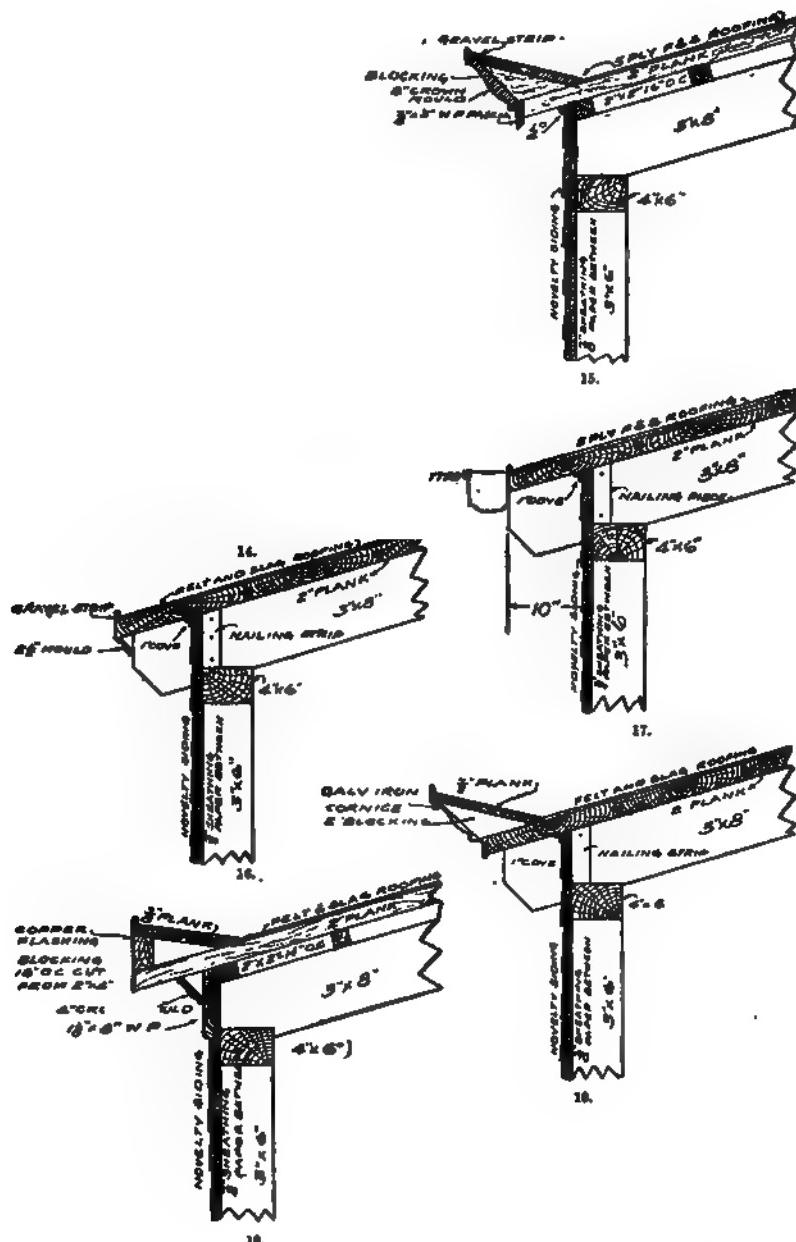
Wooden Cornices and Gutters for Mills, Stables and Heavy Buildings.
